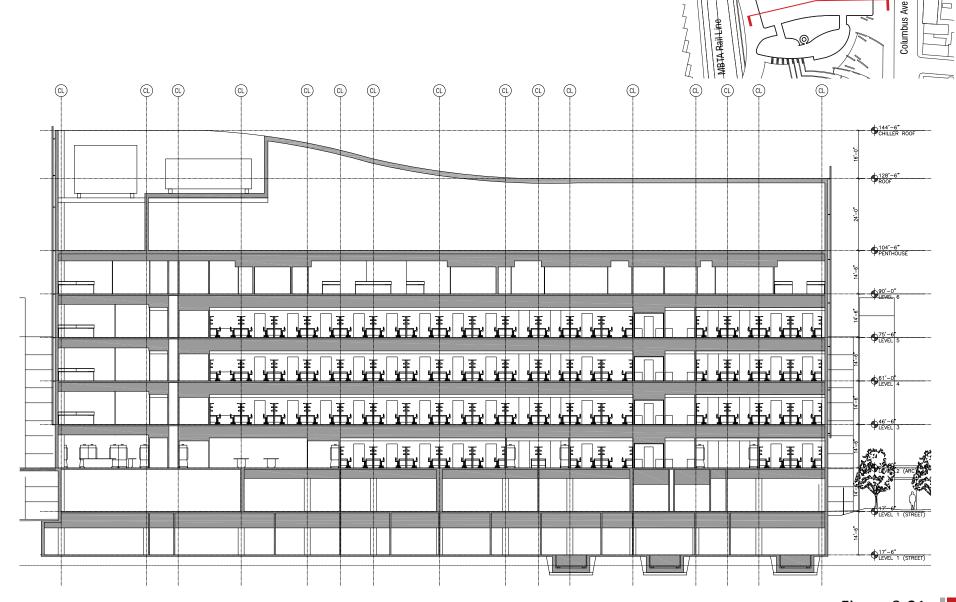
Building SectionScale: 1/32" = 1'-0"
